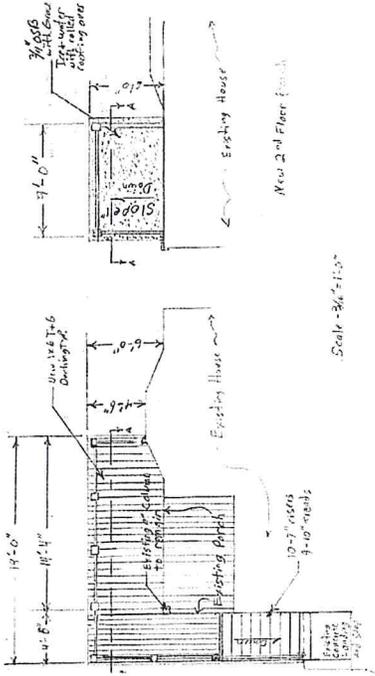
stairs to existing landing, 19' first level porch to stop at corner of bay window, 1x6 tongue and groove decking
